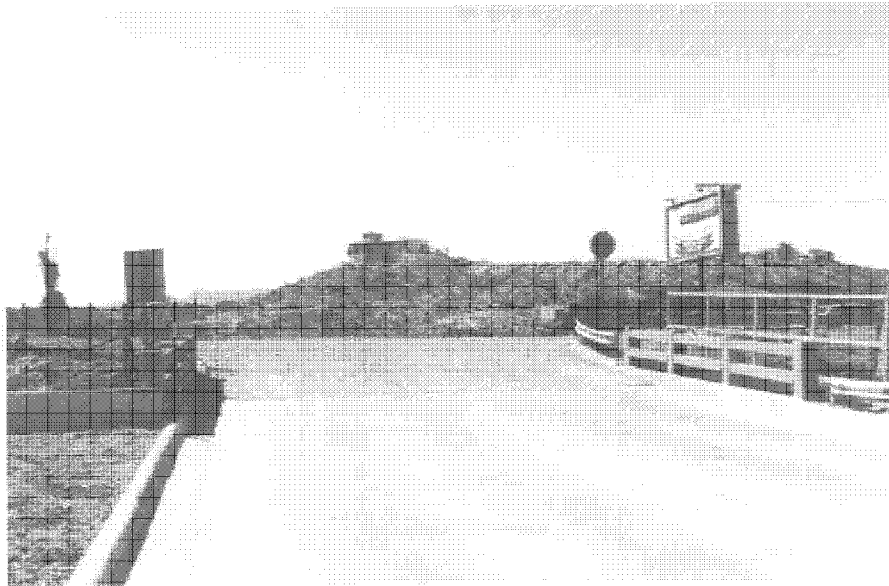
View of Smelter Bridge toward Paisano Drive, looking west, March 21, 2000.
